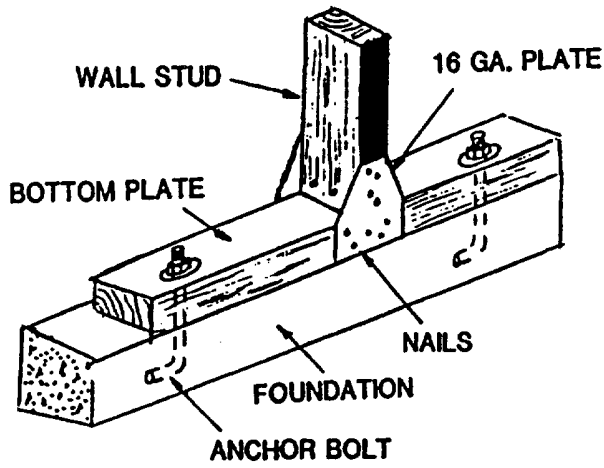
Wall-floor connection detail in wood framed construction needed to resist lateral loads.
